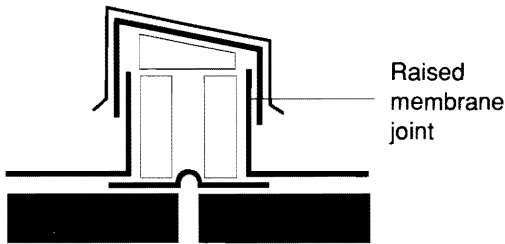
Continuity of waterproofing membrane at expansion joint on flat roof
